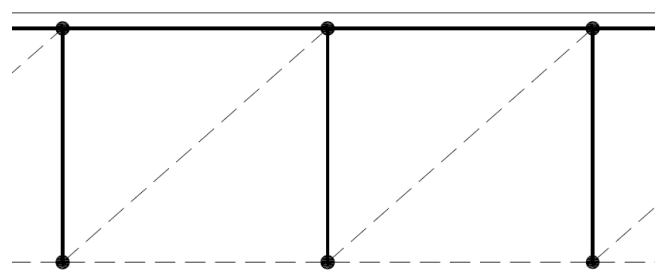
Truss model for the strengthened concrete slab frame. Dashed lines show struts and bold lines show ties.
